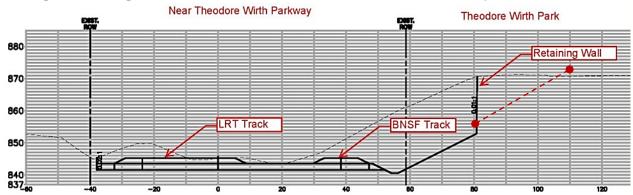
Alignment of LRT and BNSF tracks near Theodore Wirth Parkway
